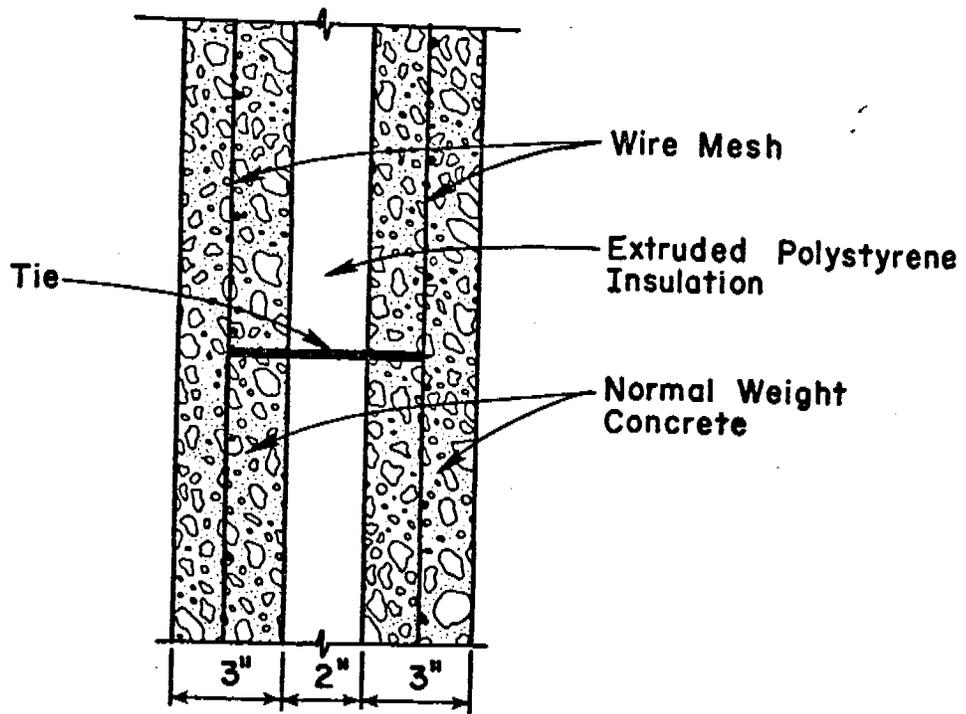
Cross Section of Insulated Sandwich Panel Walls
